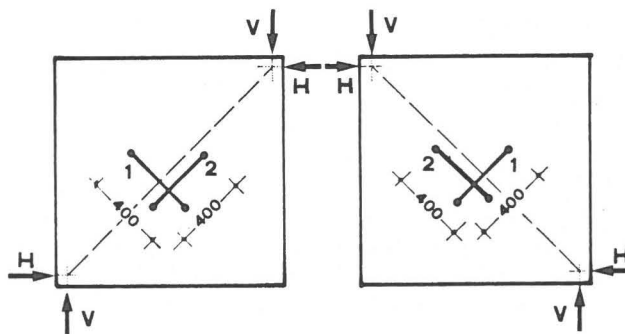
Instrumentation: 1 transducers; 2 dial gauges
